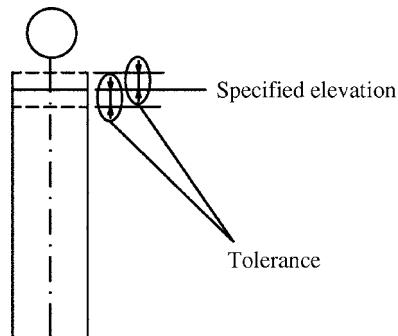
Pilasters, pedestals, and columns: elevation view.
